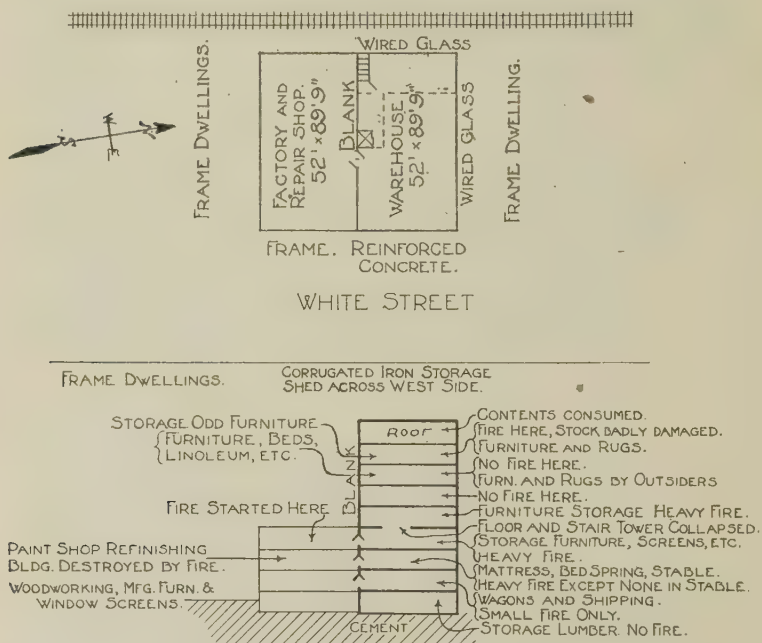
PLAN AND SECTION OF MULLEN AND BUCKLEY WAREHOUSE, SHOWING ITS LOCATION AND NATURE OF OCCUPANCY.
